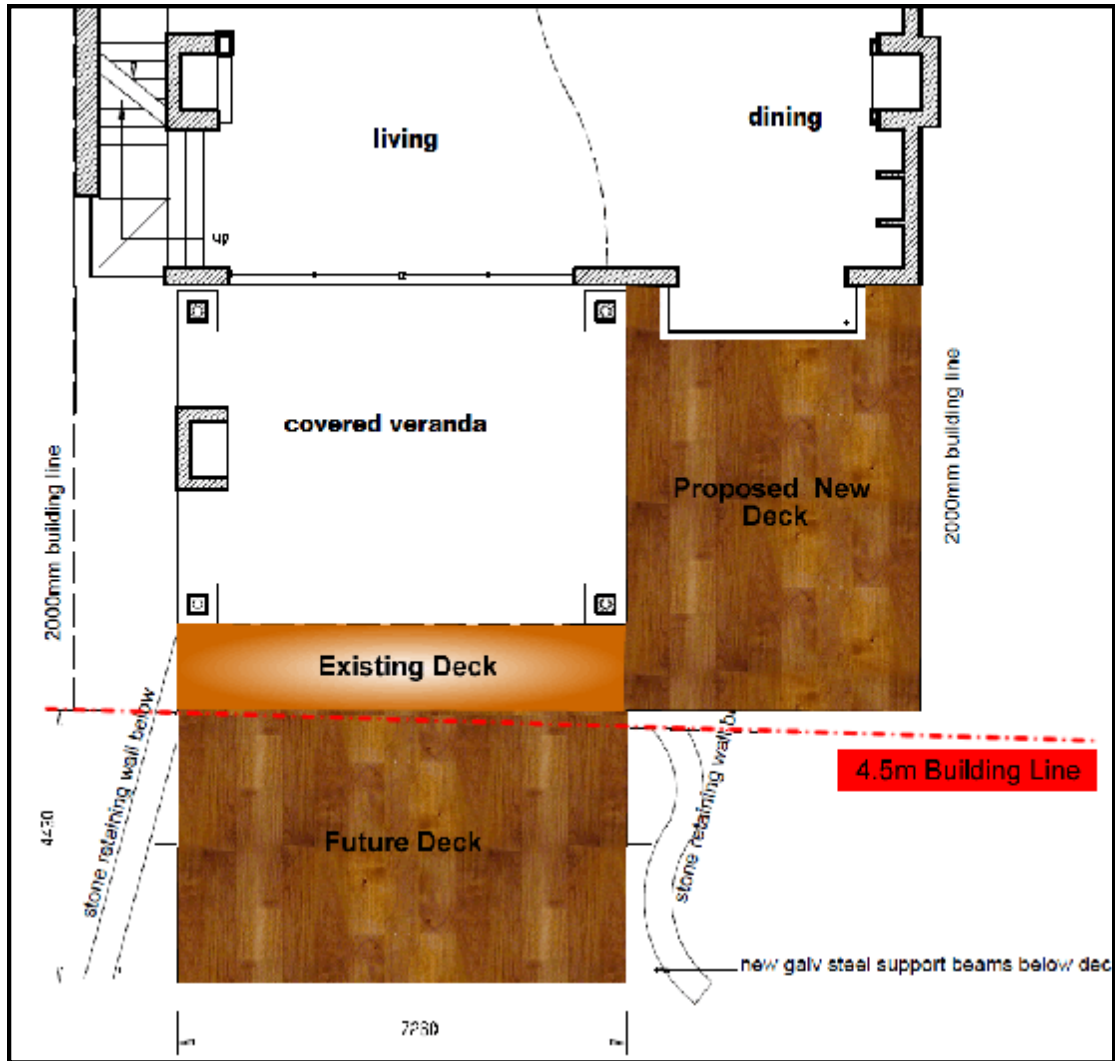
PROPOSED DECK DEVELOPMENT ENCROACHES 4.5m BUILDING LINE
